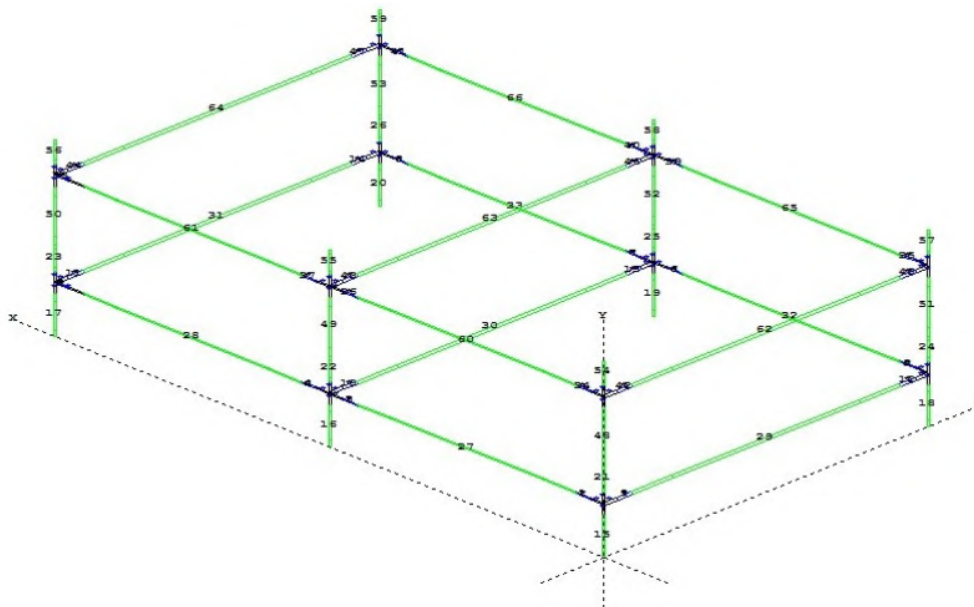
Isometric view of SA1 numerical model without floor diaphragm.
